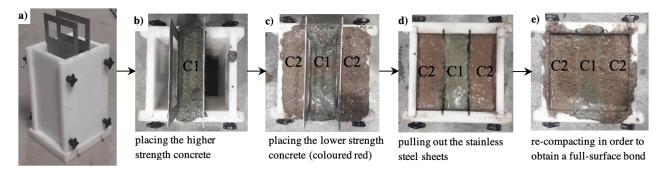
Illustration of the production process of the prism-shaped test specimens with different concrete mixtures.
